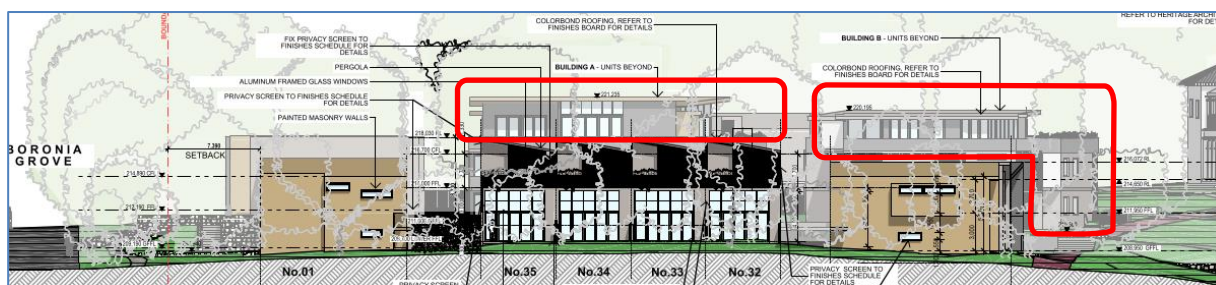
Western view of the site, with the residential flat buildings identified in red.
